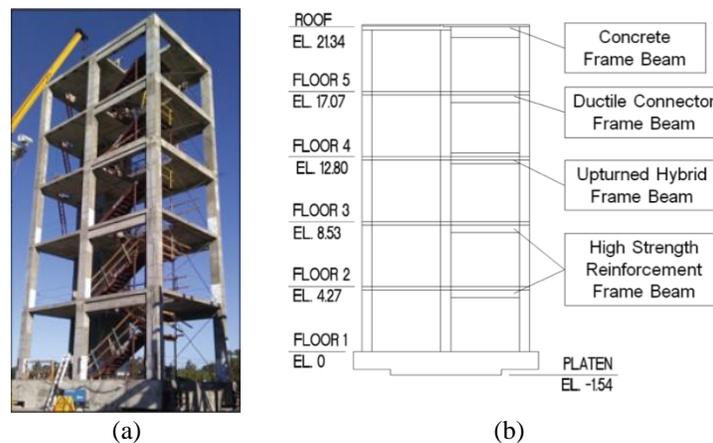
Building specimen (a) skeleton; (b) elevation view (elevation in meters) [images and schematic from Chen et al. 2014].
